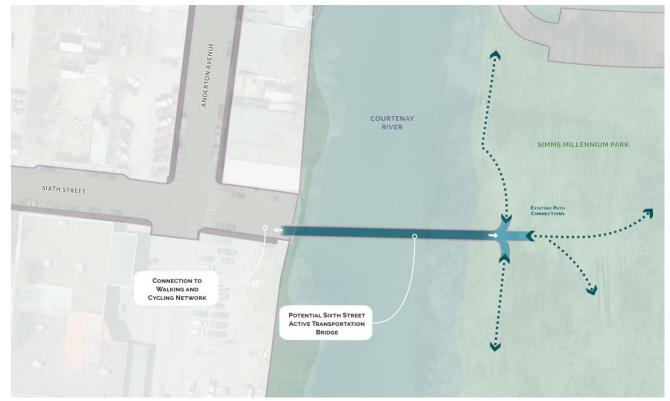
Conceptual Location and Connections of the Sixth Street Multi-Use Bridge
